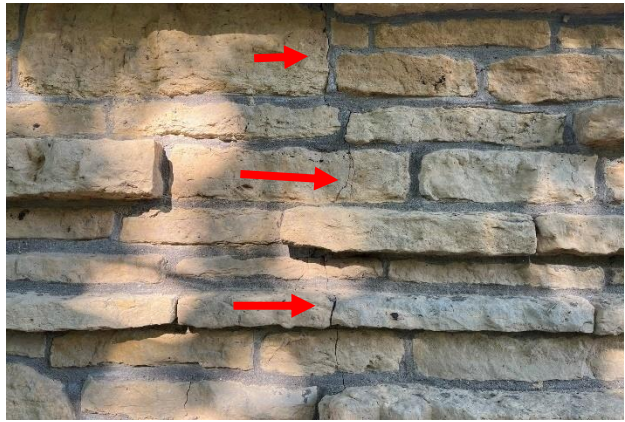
Cracks extended through mortar joints and stone units.
